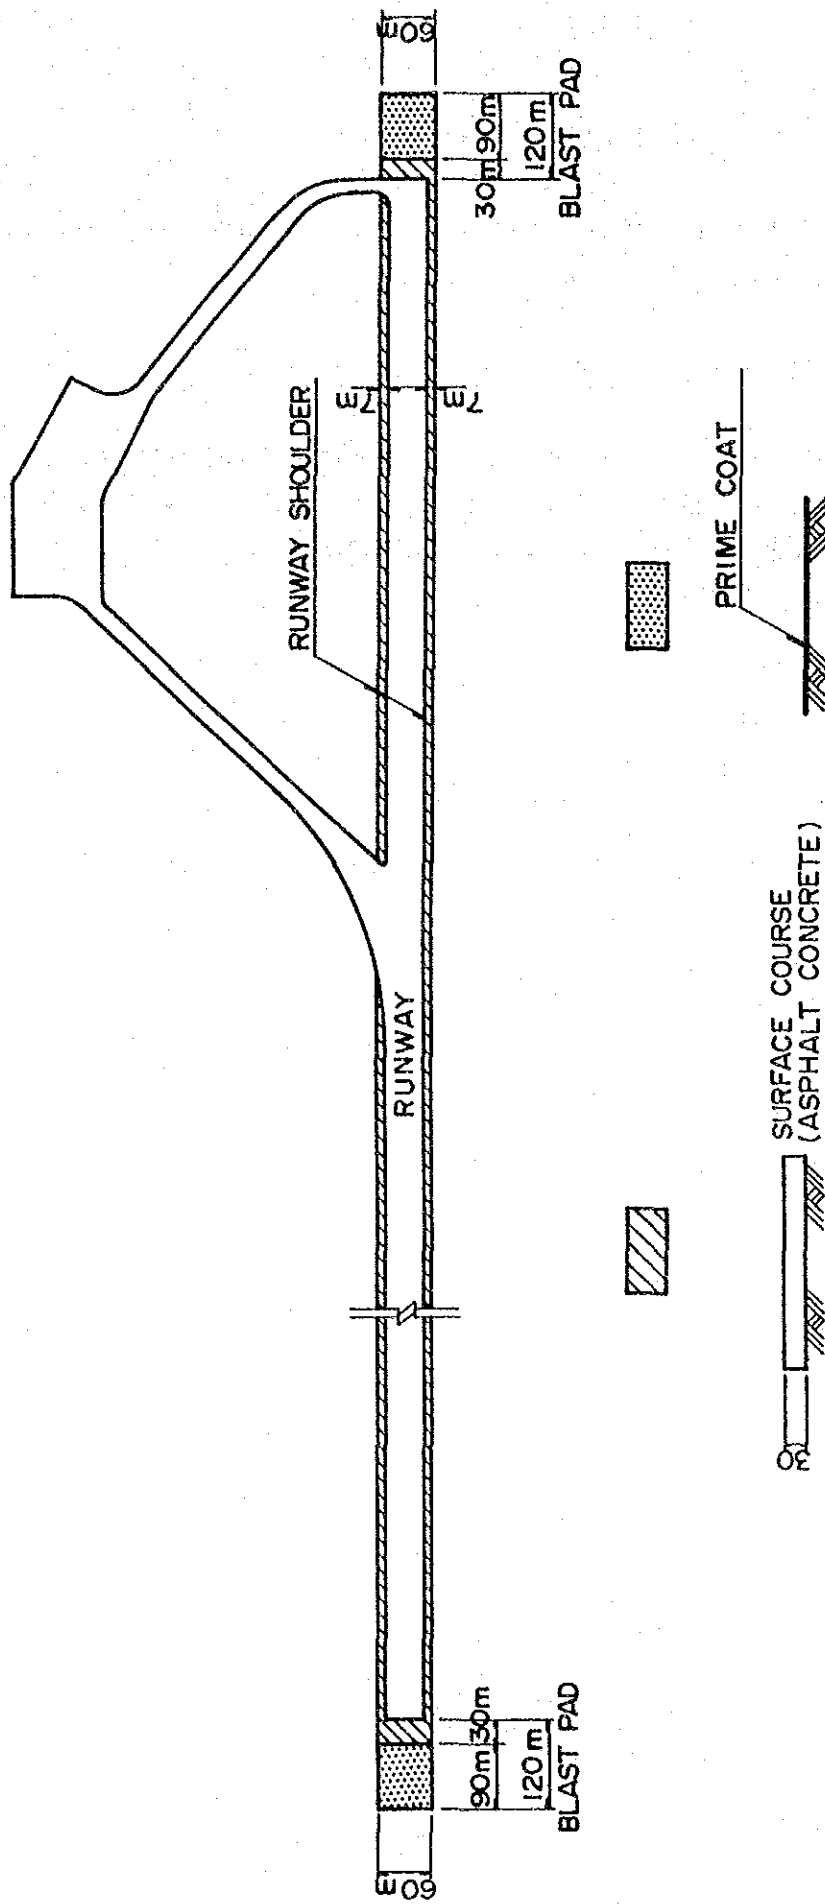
Plan of Runway Shoulders and Blast Pads
